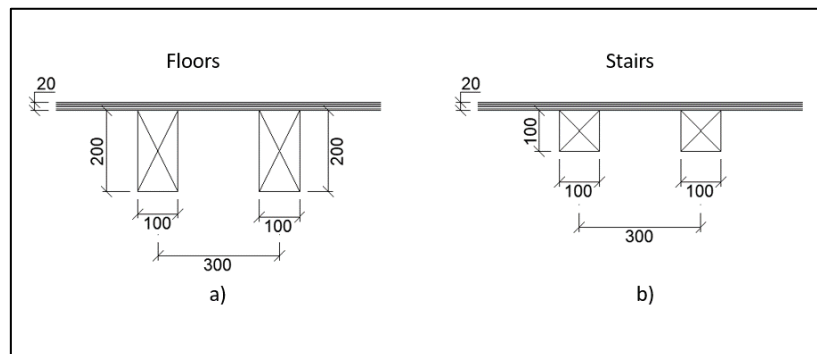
a) Timber joists considered for floors, b) timber joists considered on stair well.
